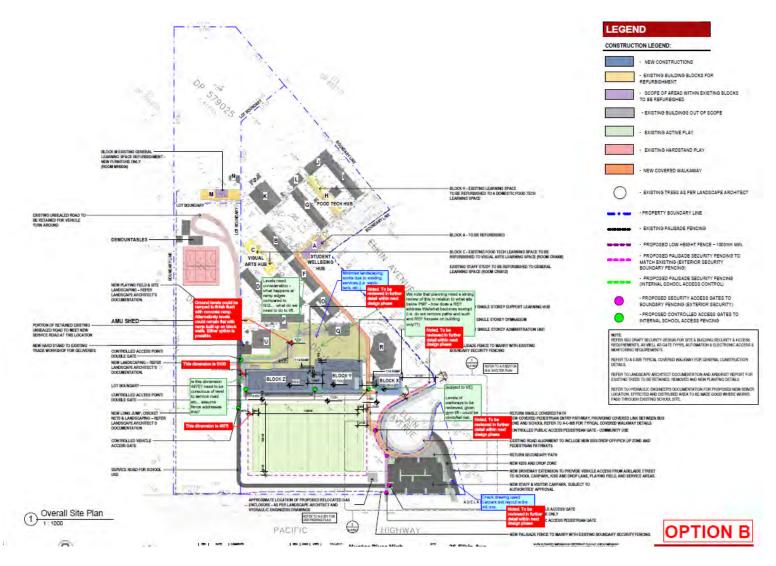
Overall Site Plan (Extract from Drawing A-0-001 of the proposed Site plan (reference: Building Height Exercise - Option B (SINSW_RCC Review).pdf)
